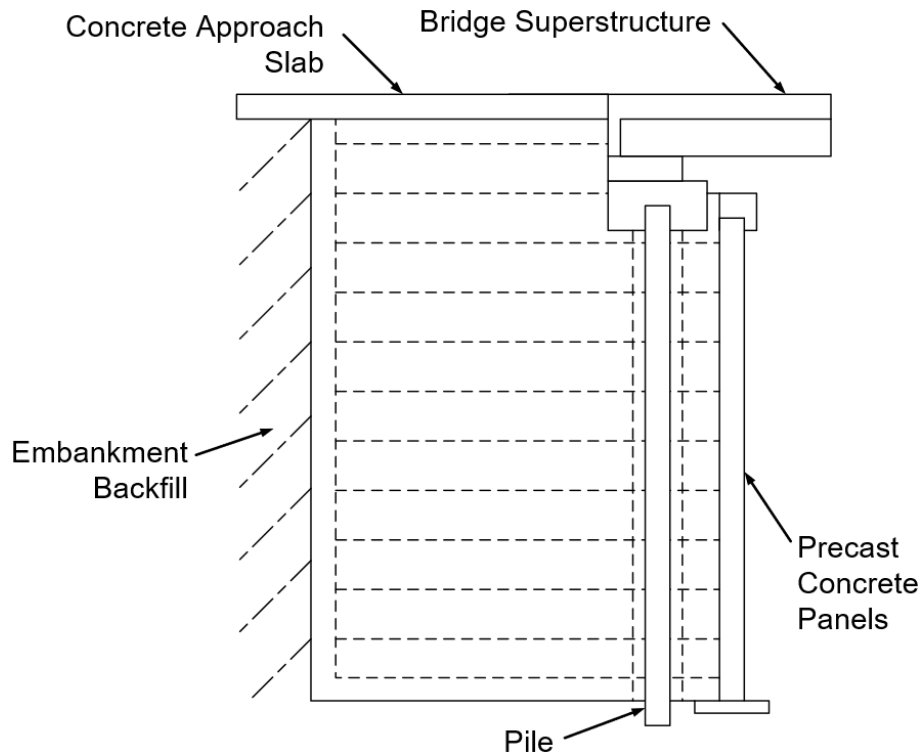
Cross Section - Mechanically Stabilized Earth Abutment
